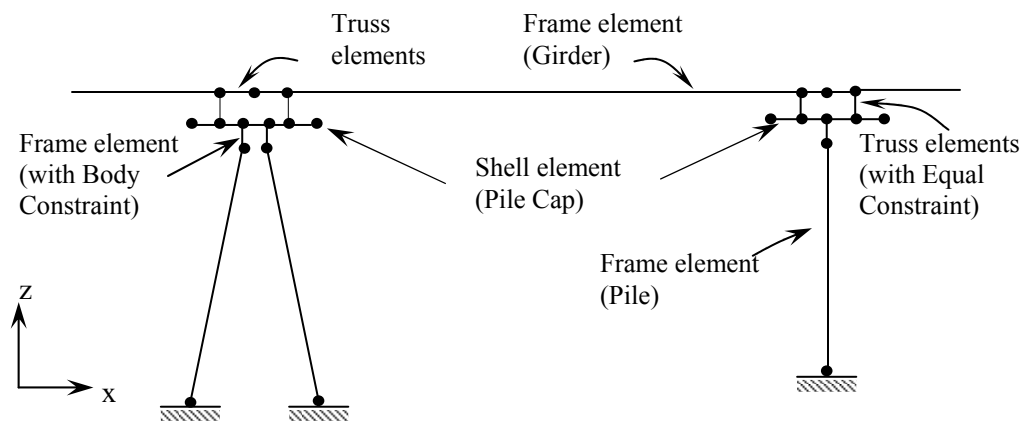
Longitudinal profile of girder, pile cap, pile and connecting elements.
